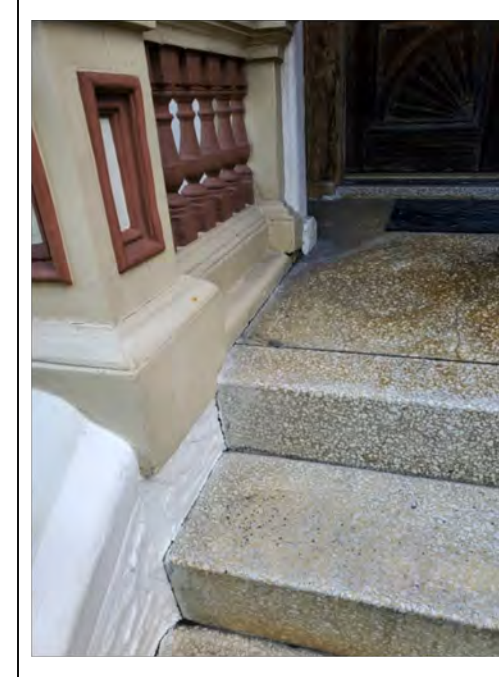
Cracking and gaps in concrete stairs allowing water to seep into enclosed crawlspace below stairs.
